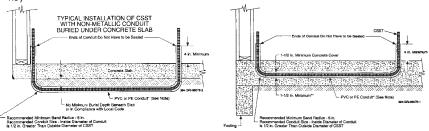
Installation in Non-Metallic Conduit Under Slab
